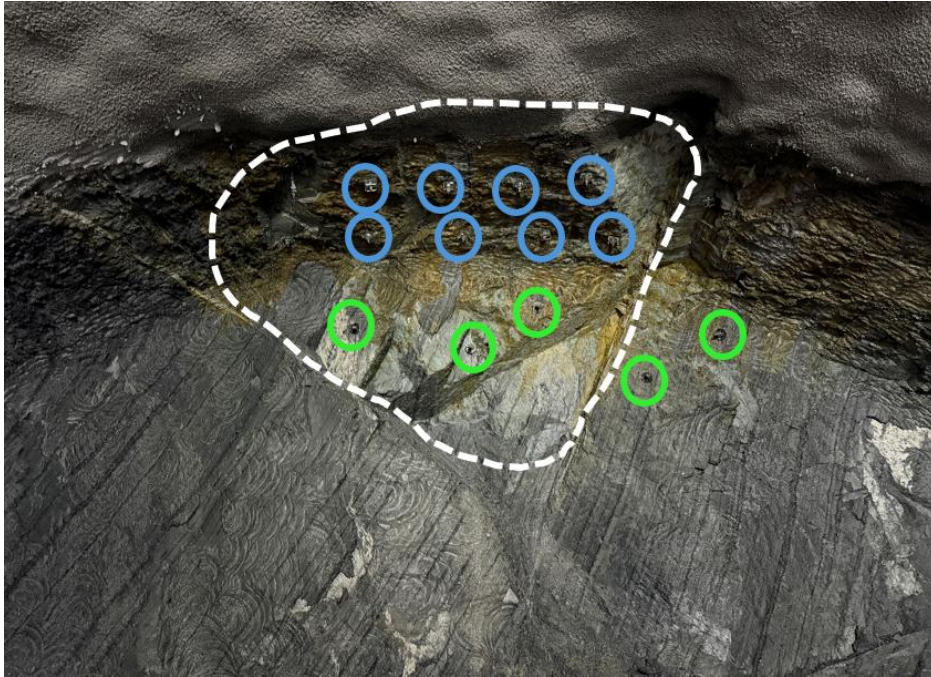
Pattern CT rock bolts (blue) and GRP face dowels (green) installed mid-excavation with inferred altered rock denoted (white).
